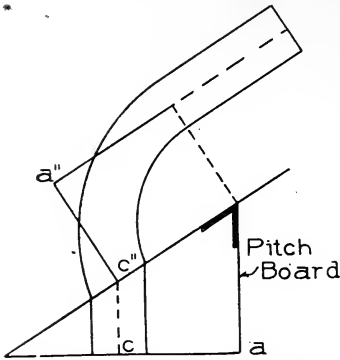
Drawing Face-Mould for Wreath from Pitch-Board.
